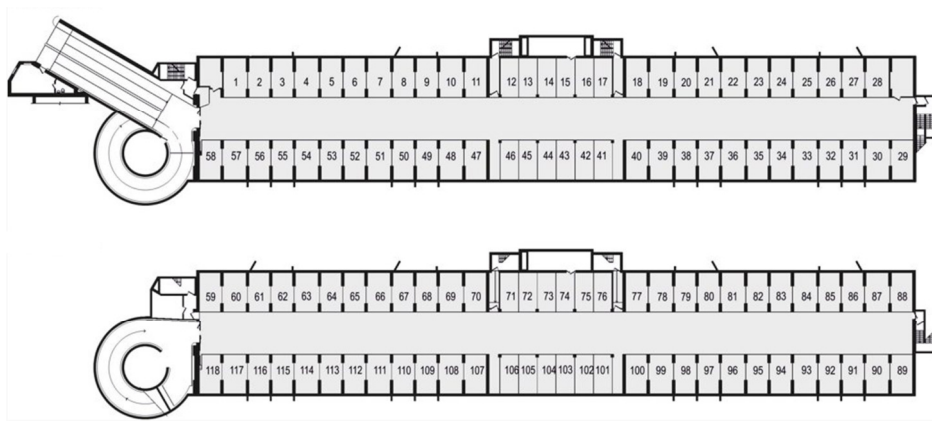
Typical scheme of a two-level underground parking lot (France)
